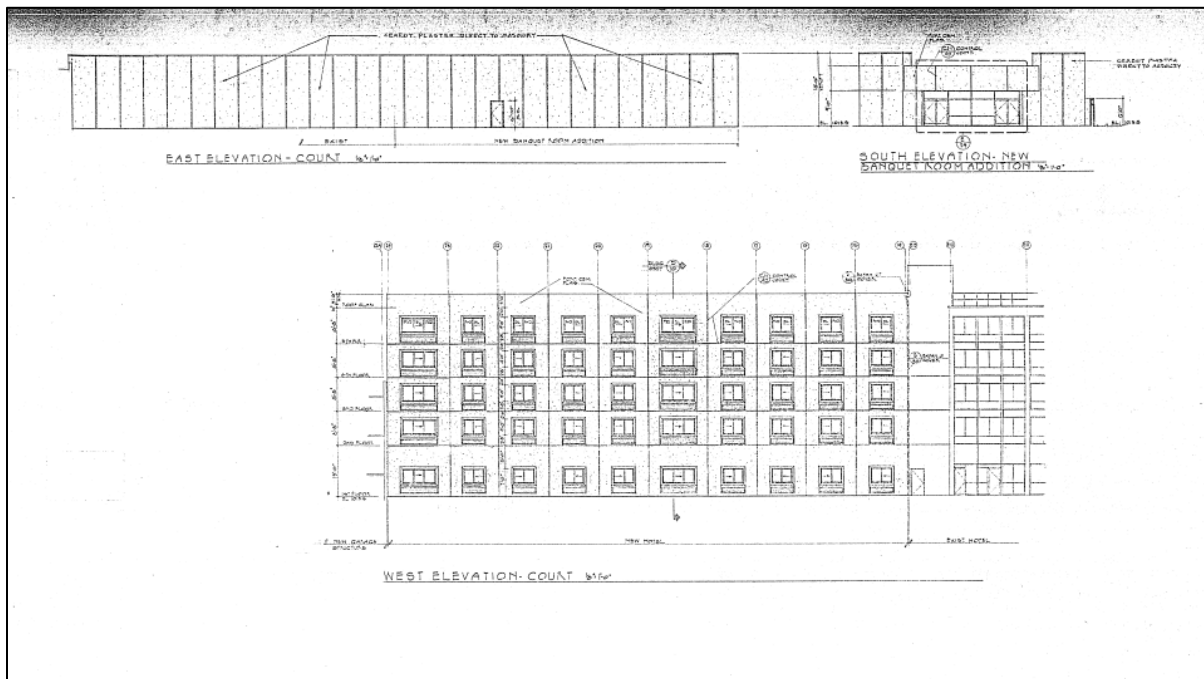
East, south, and west elevations, 1984 (Rissman & Rissman Associates)
